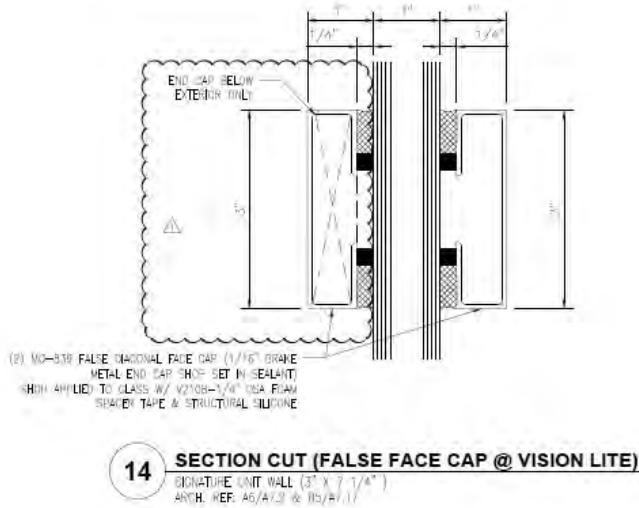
Detail #1. Diagonal section of the false cap detail. Drawing 4-107.
